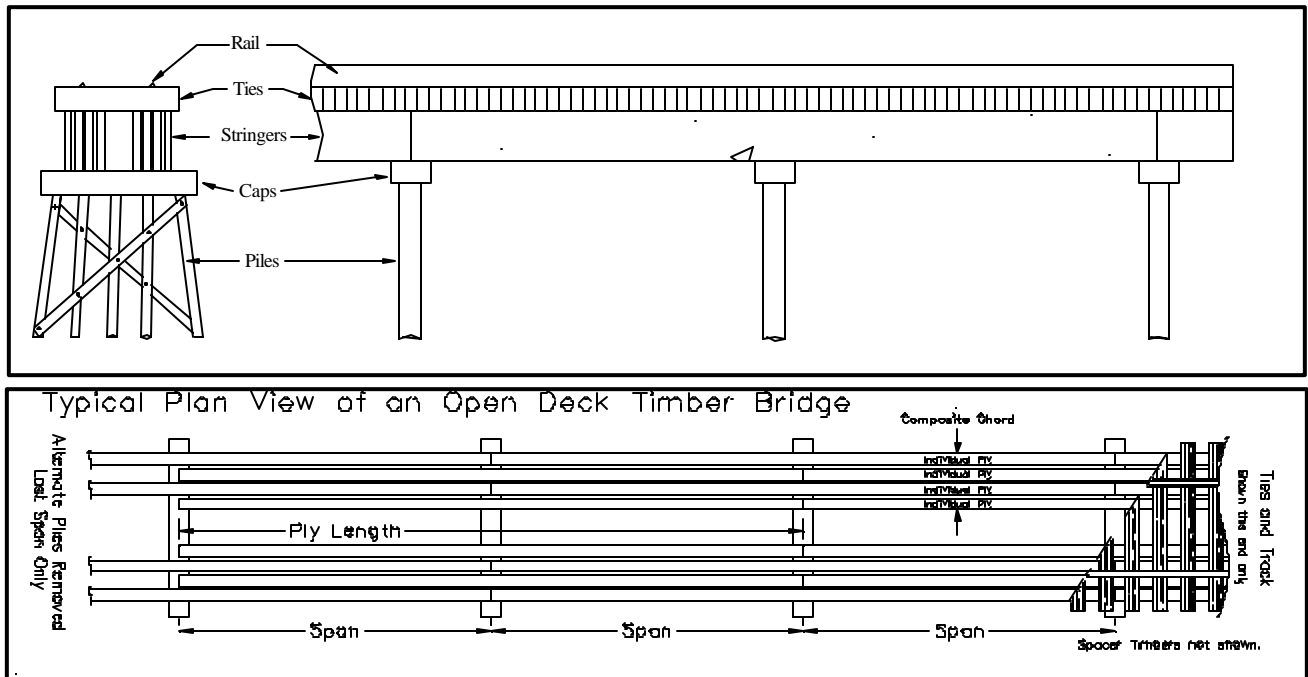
General Configuration of an Open-Deck Timber Trestle Railroad Bridge
